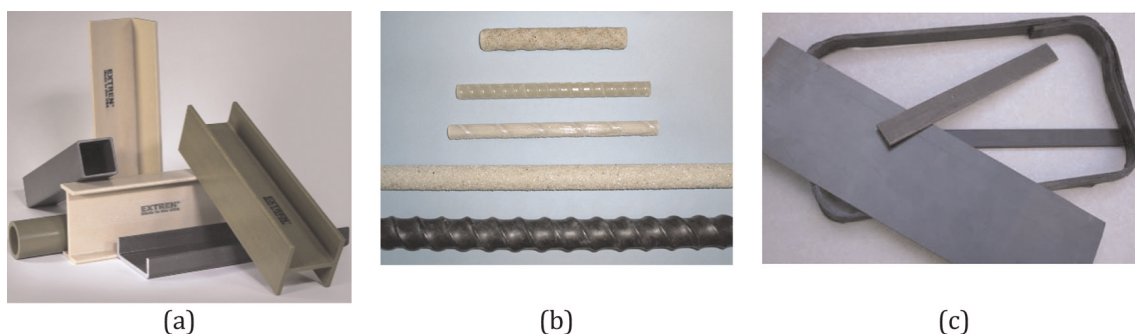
Pultruded FRP shapes, rebars and strips: (a) FRP structural profiles or shapes [24]; (b) FRP-reinforcing bars [33]; (c) FRP plates and strips [18].
